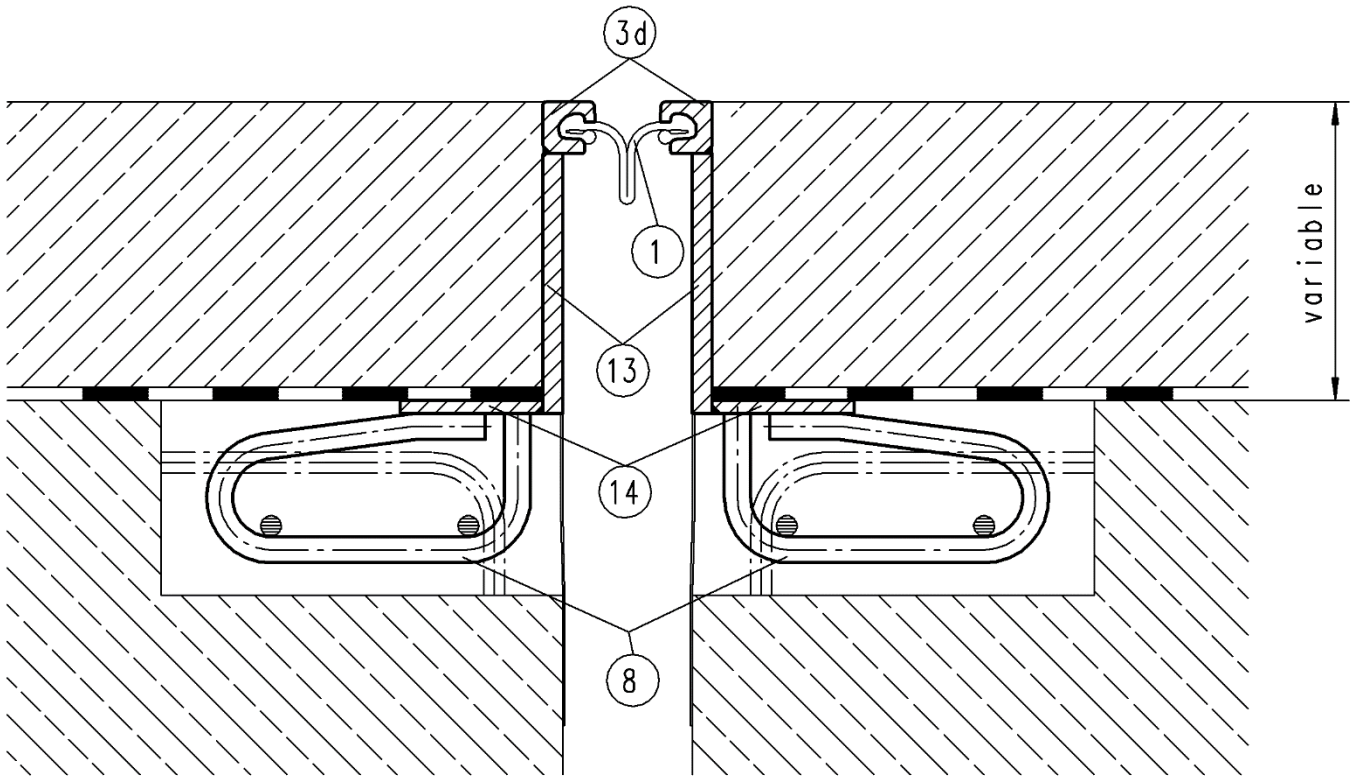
Exemplary cross section of the nosing expansion joint MAURER XC1 Expansion Joint with edge profile D1/40, including anchorage, variable pavement thickness for footpath
